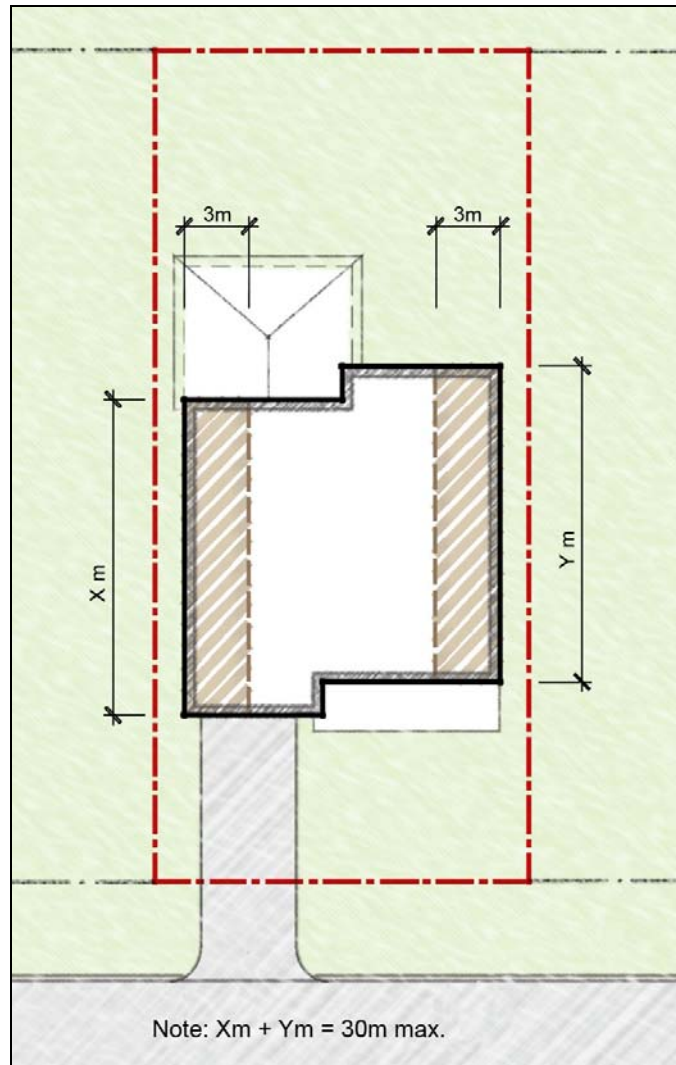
Maximum Total First Floor Wall Length of a Two Storey Dwelling
